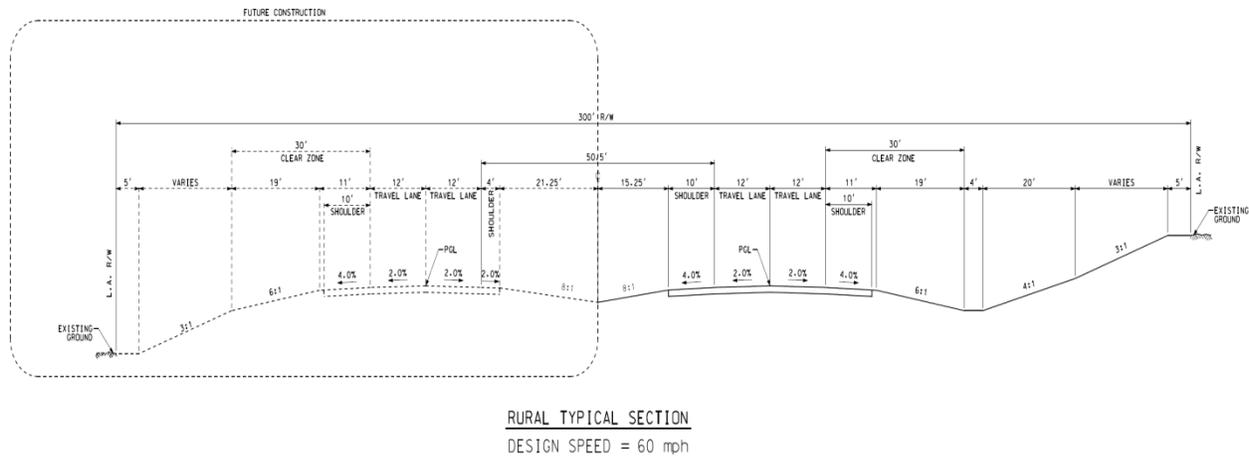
PROPOSED TYPICAL CROSS-SECTION
